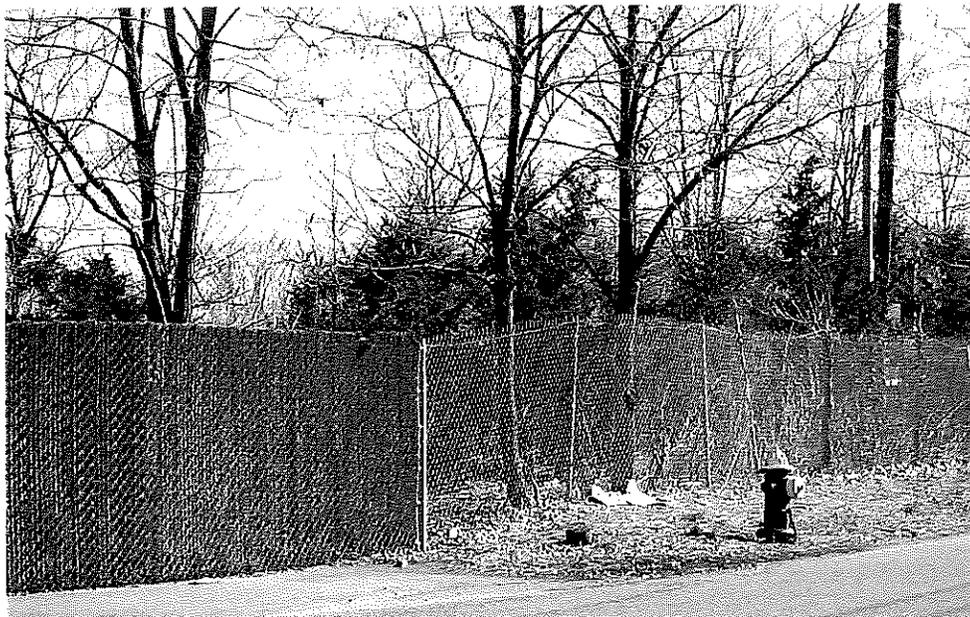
Facing East— Along Spicer Avenue (pvc lined fence extended to existing landscaping buffer).
